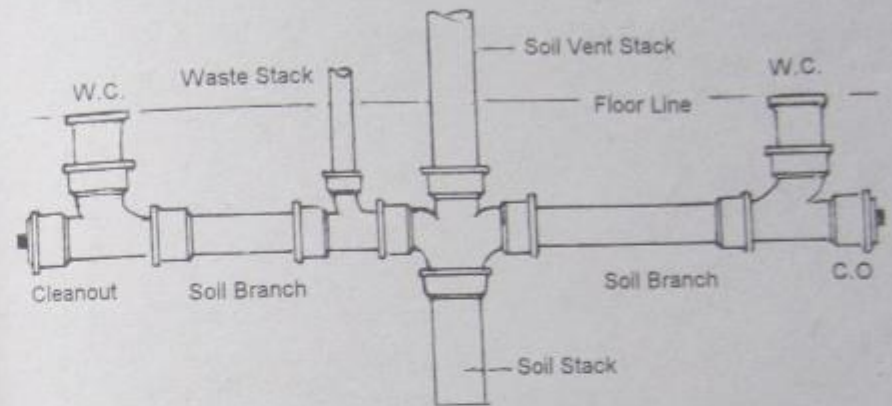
THE SOIL BRANCH AND CLEANOUT
